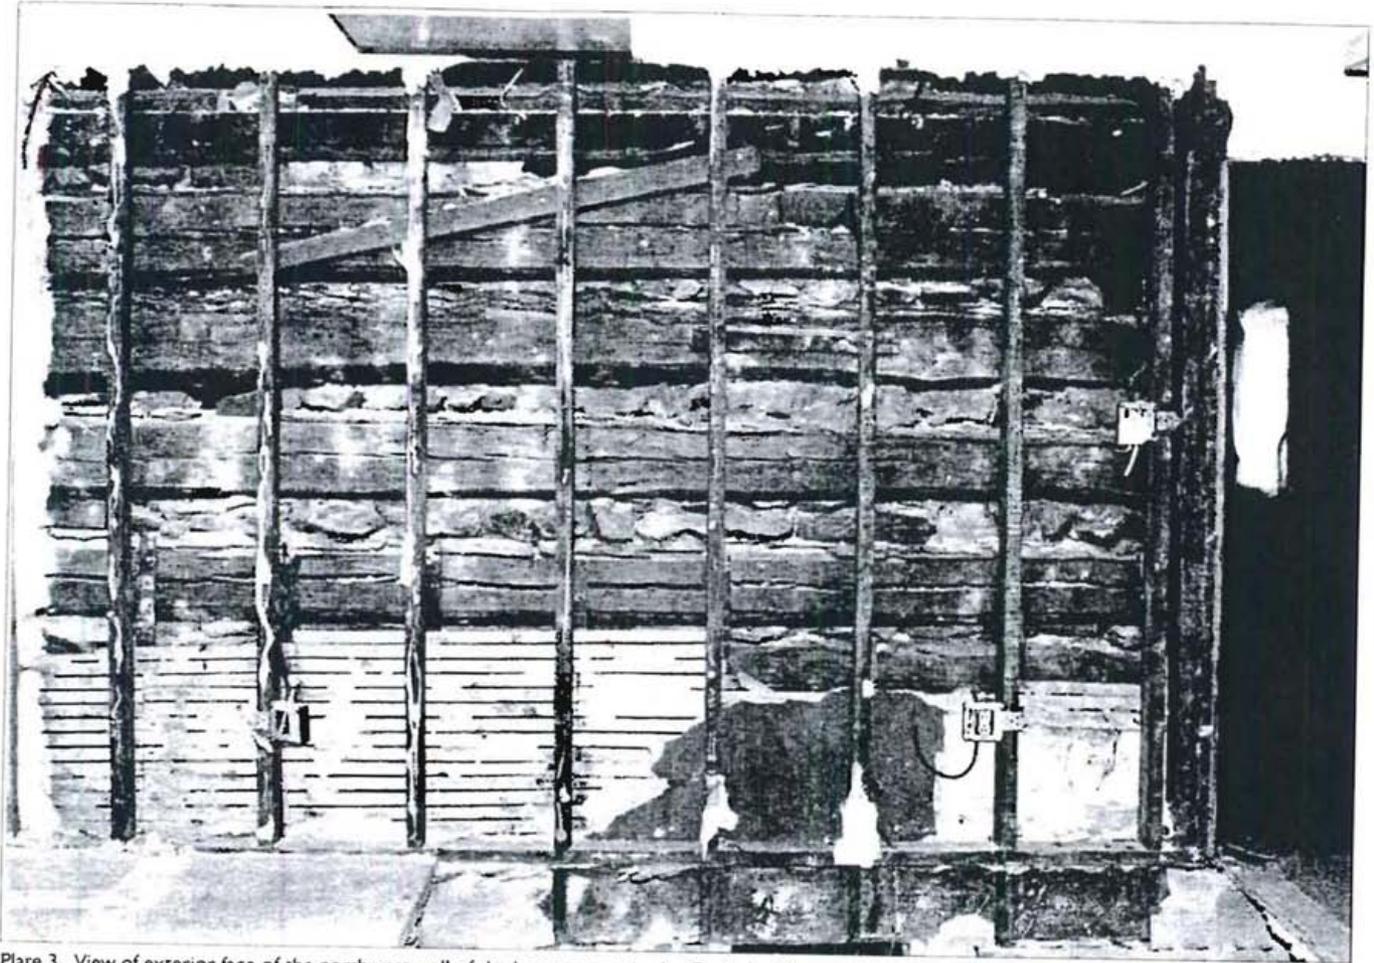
View of exterior face of the northwest wall of the log structure in the Guthrie-Giacomelli House/Tweed's Tavern, showing log construction and original exterior lath (Photographer: Dawn Turner) [HRI Neg. # 98039/18:36].
